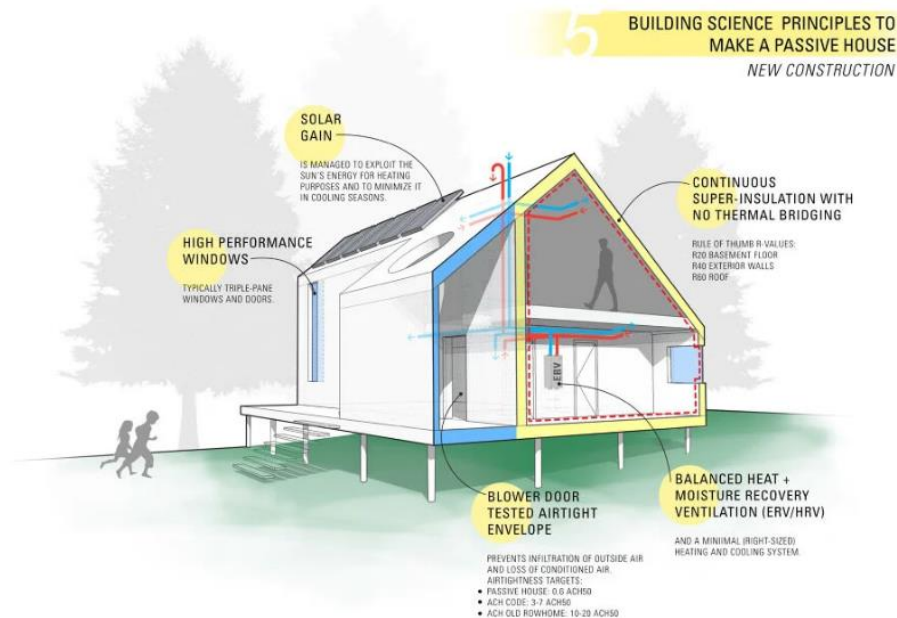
Illustration of Passive House building design.<sup>98</sup>
